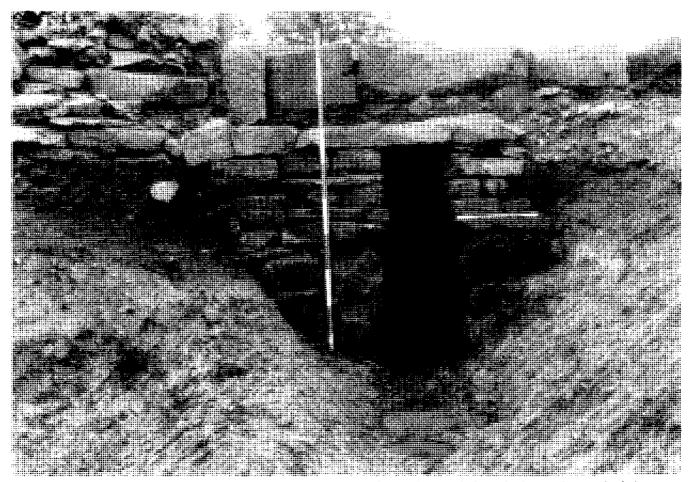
Stone bridge-culvert (1927) spanning ditch 1809, and carrying road through the north portal of the porta principalis sinistra
